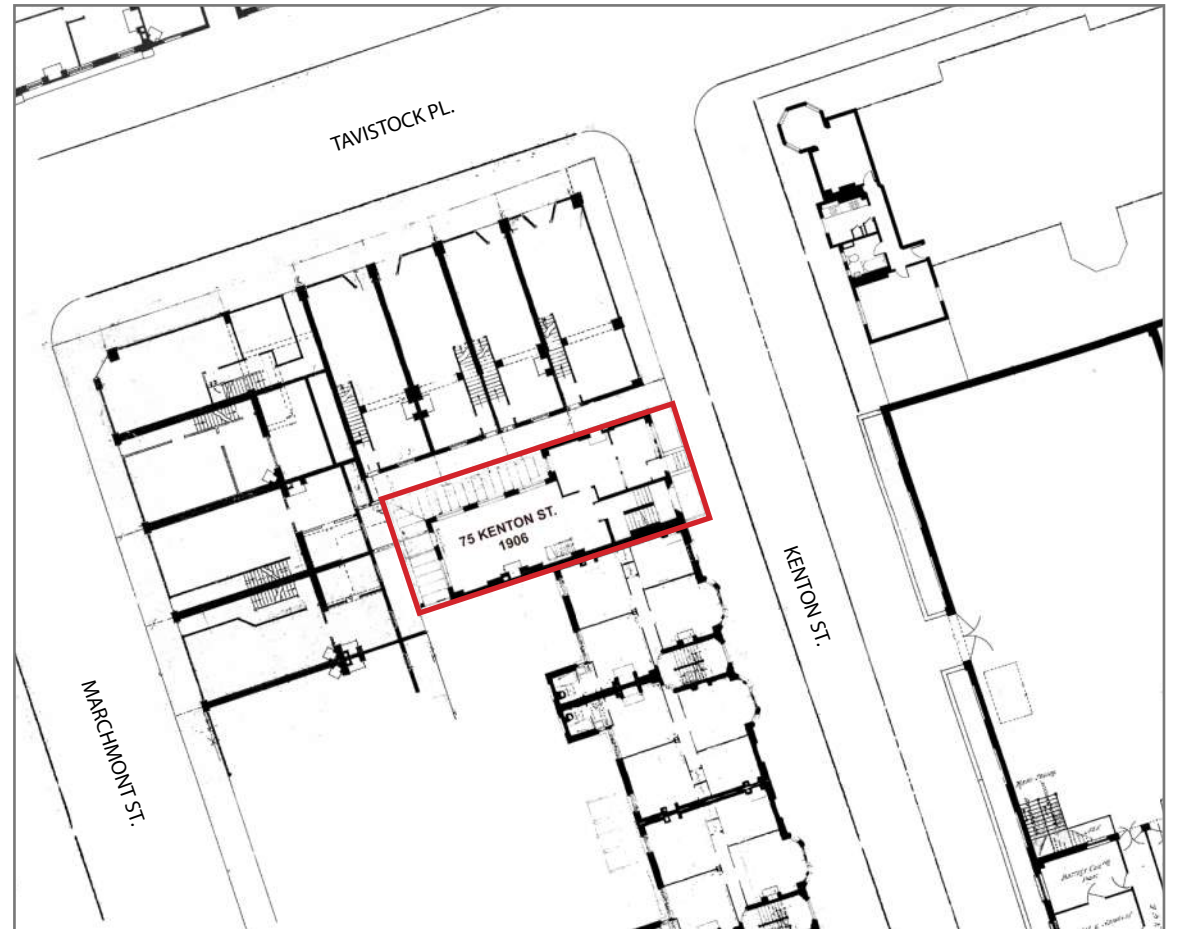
Composite Historic Building Plans of the surrounding buildings, ca.1906-1908
